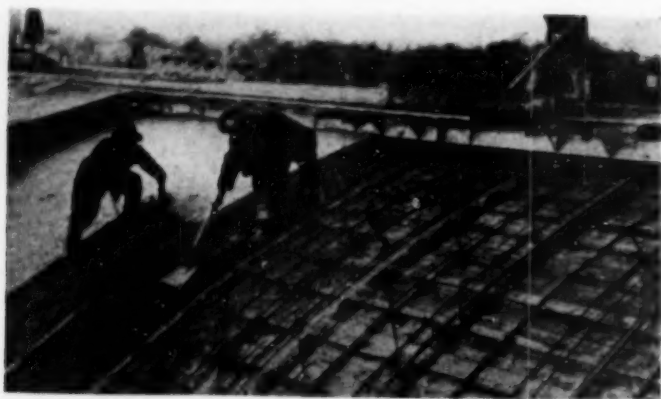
Garage at Donnybrook : Concreting the Roof.
